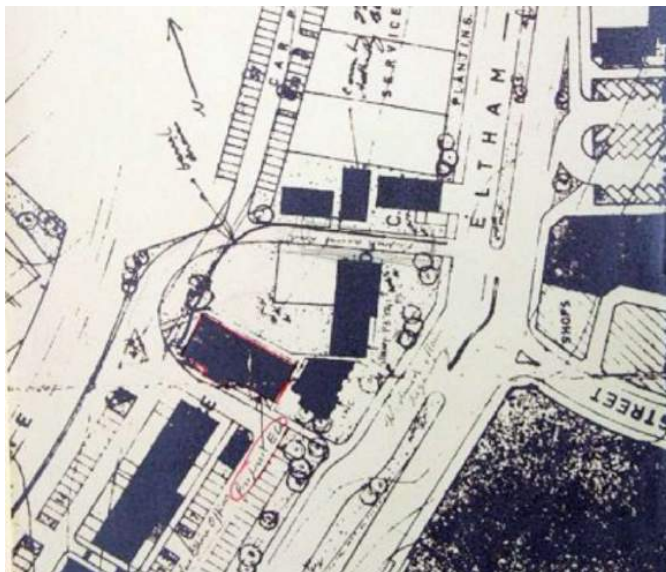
Site plan prepared c.1965, showing location of the proposed Elderly Citizens Centre (outlined in red). (Source: Public Building File No.13712, Unit 1624, VRPS 7882, PROV, cited in Westbrooke 2010:16)
